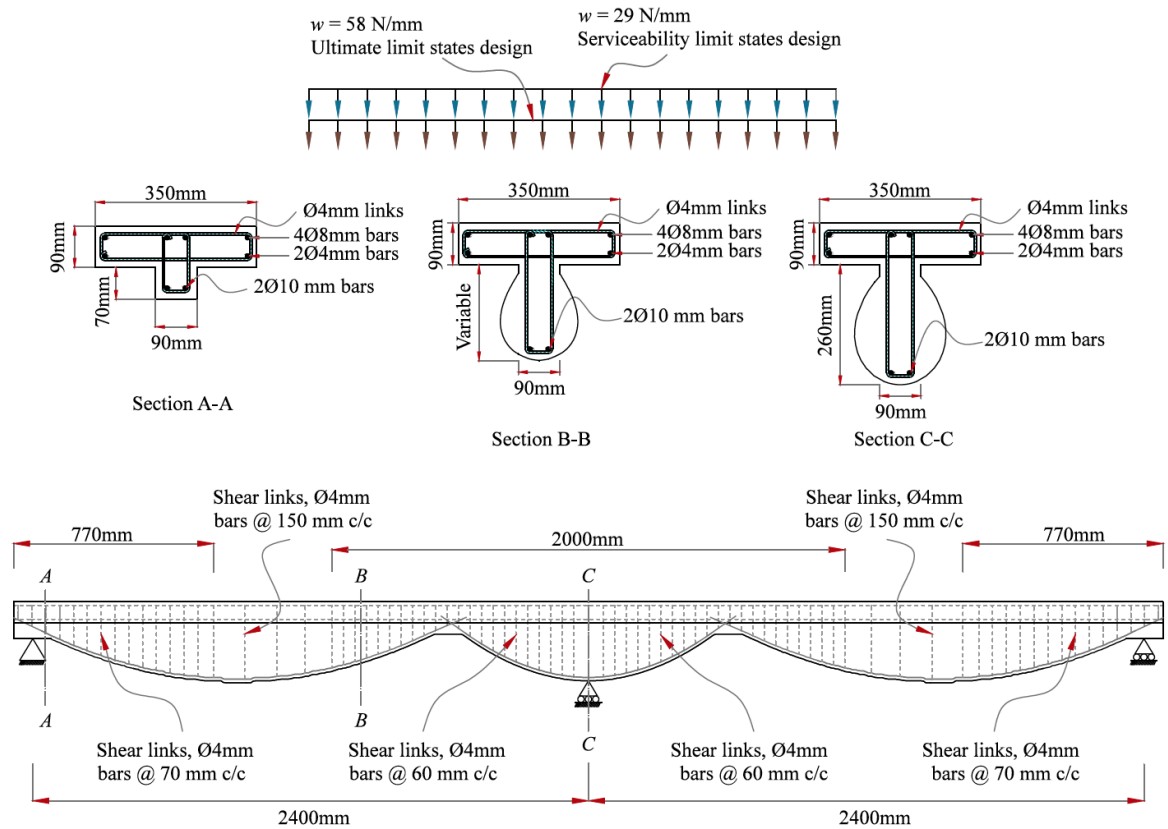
Sectional and longitudinal details of beam FF-OSS-C
